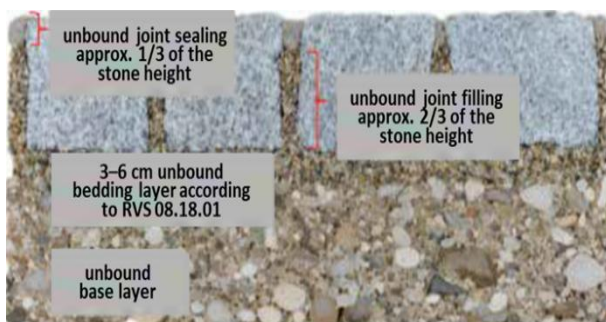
Cross-section of an installed cobblestone pavement (shown here with 8/10 cm granite blocks) constructed using the flexible method
